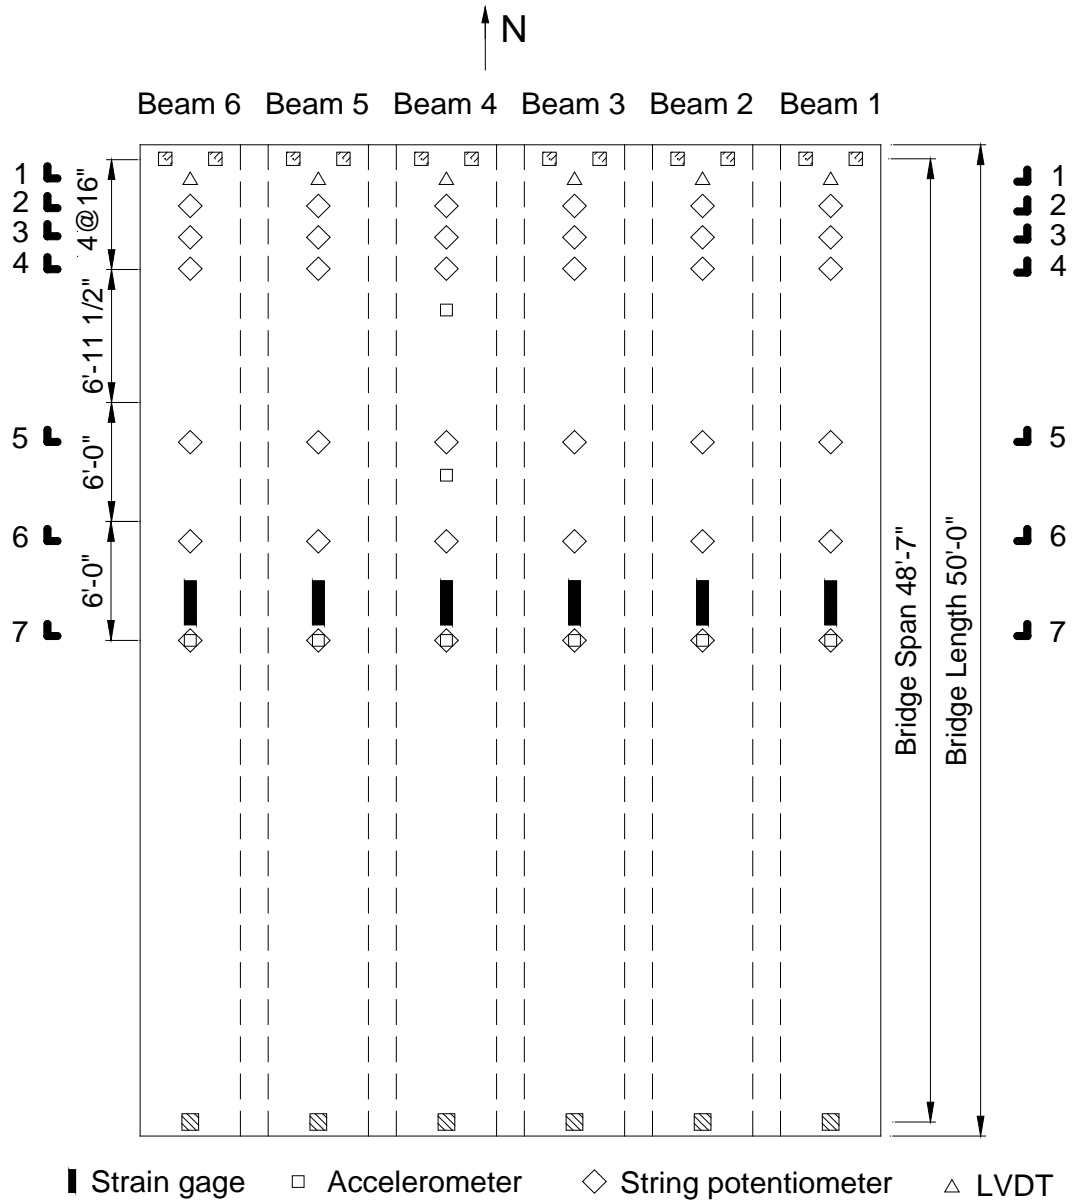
Bottom View of Instrumentation on US 69 Bridge.
